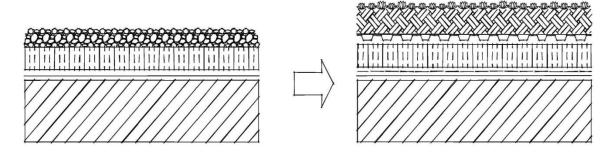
Ballast Replacing with Extensive System in Inverted Roofing System, Illustrated by Author Based on Castleton et al., (2010)
